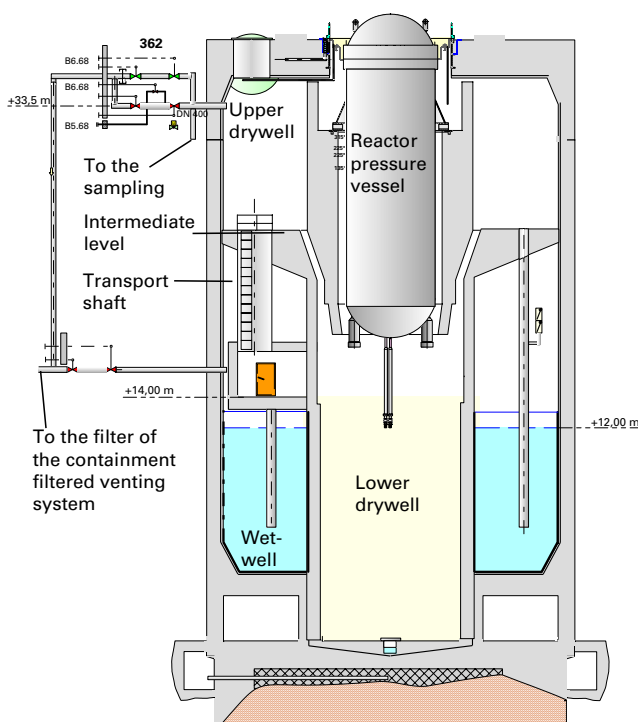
A diagrammatic plan of the Olkiluoto 1 and 2 containment buildings.
